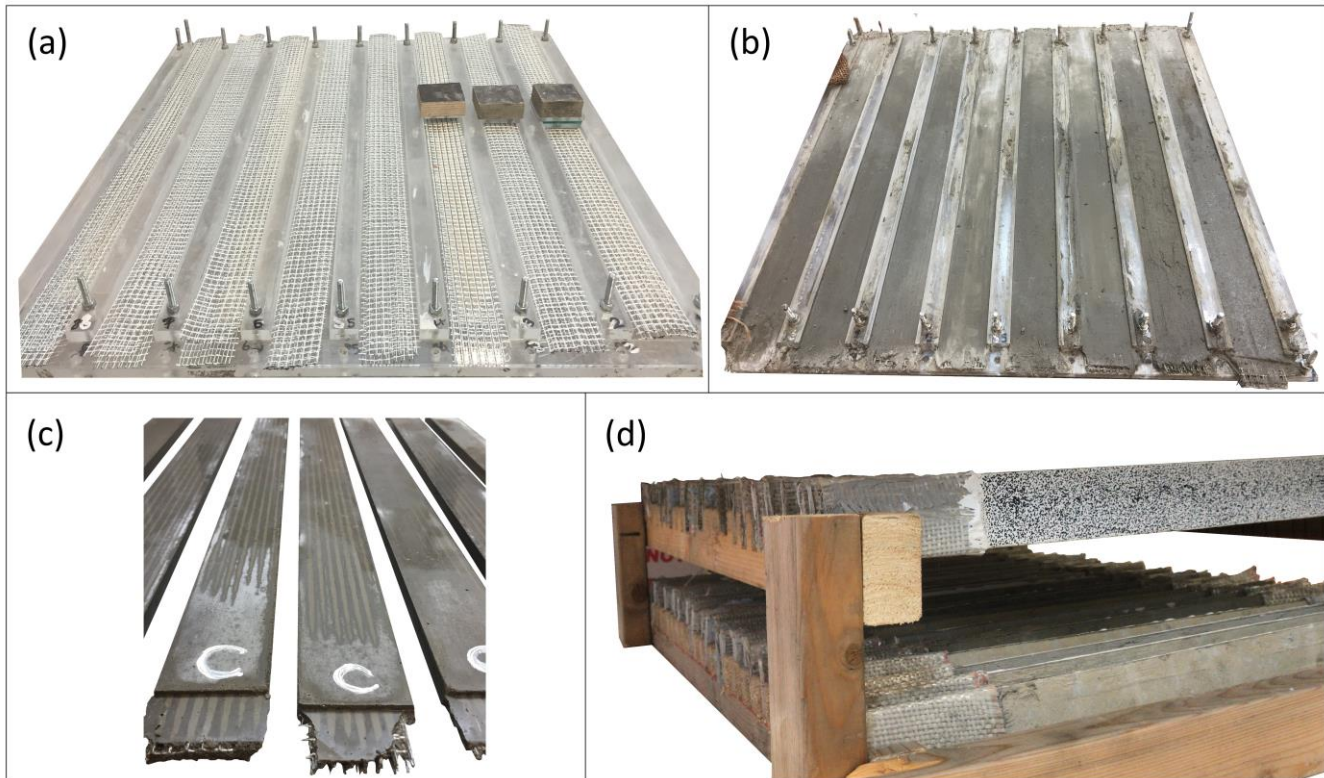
The mould for casting the SRG coupons with the steel textiles cut to length (a), after casting (b), after demoulding (c), and the SRG coupons with GFRP end strengthening (d).
